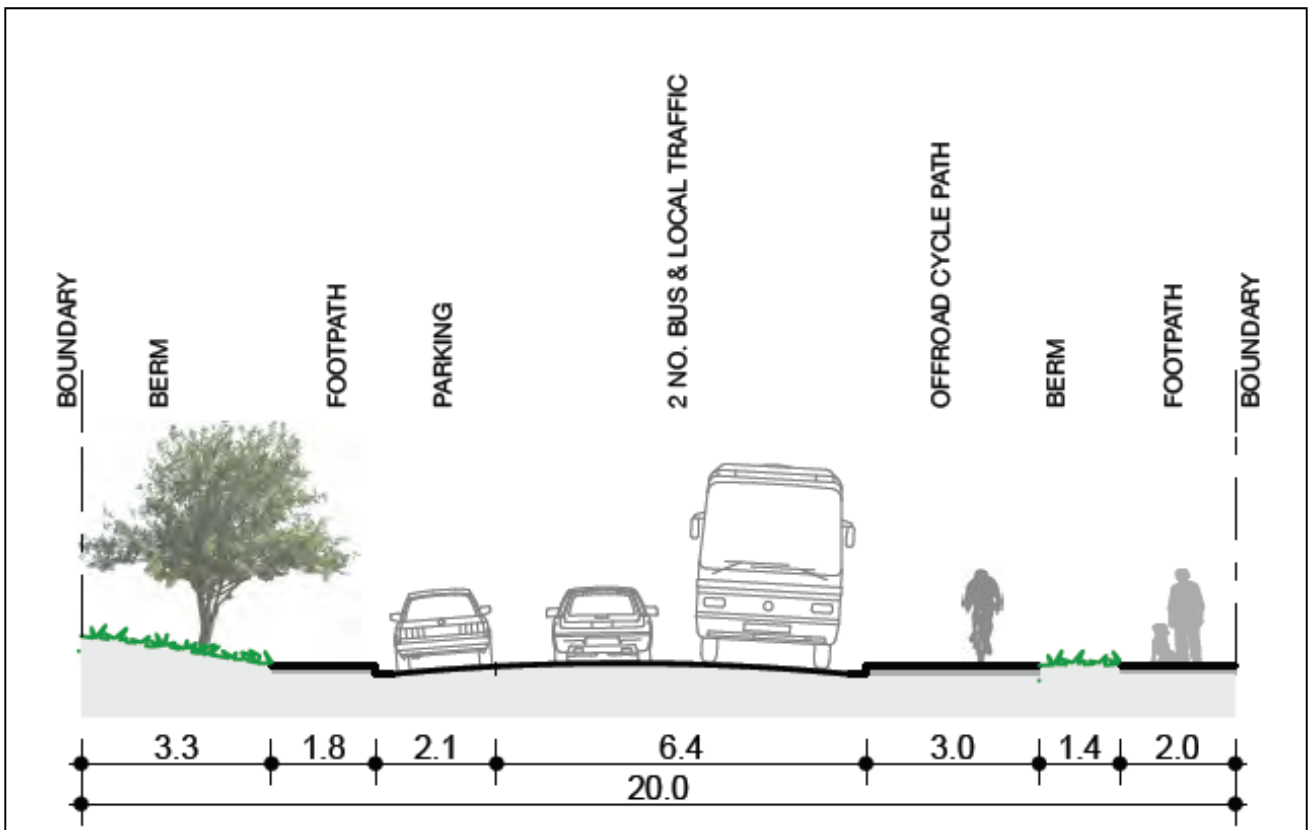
Future Local Road Layout for Byron Avenue (Connecting with Upper Shoal Bay Link)
